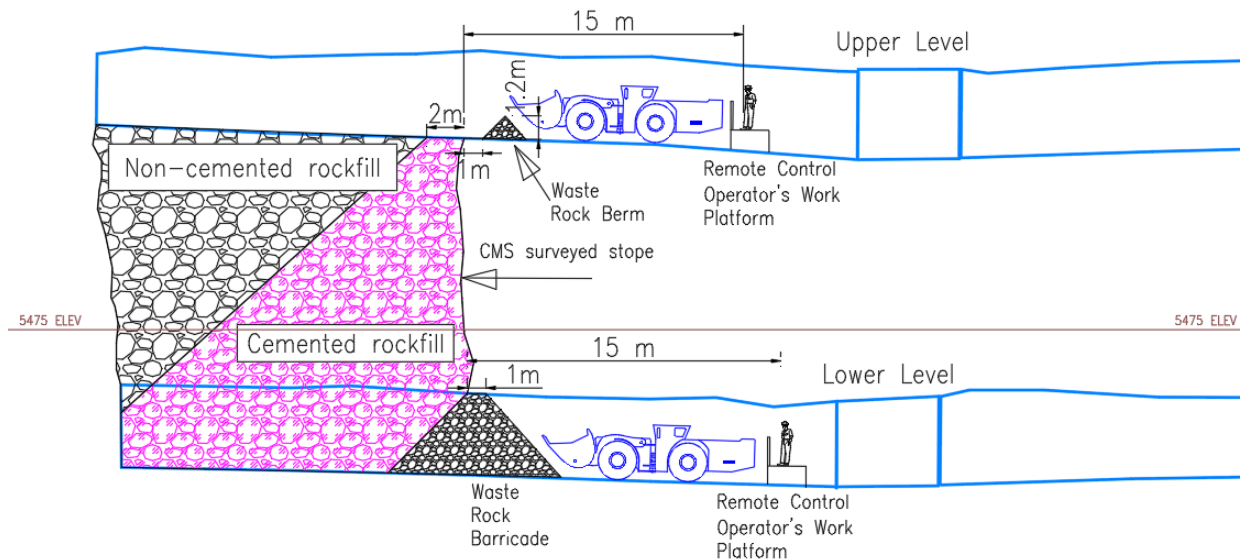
Schematic representation of the proposed partial use of cemented rockfill
